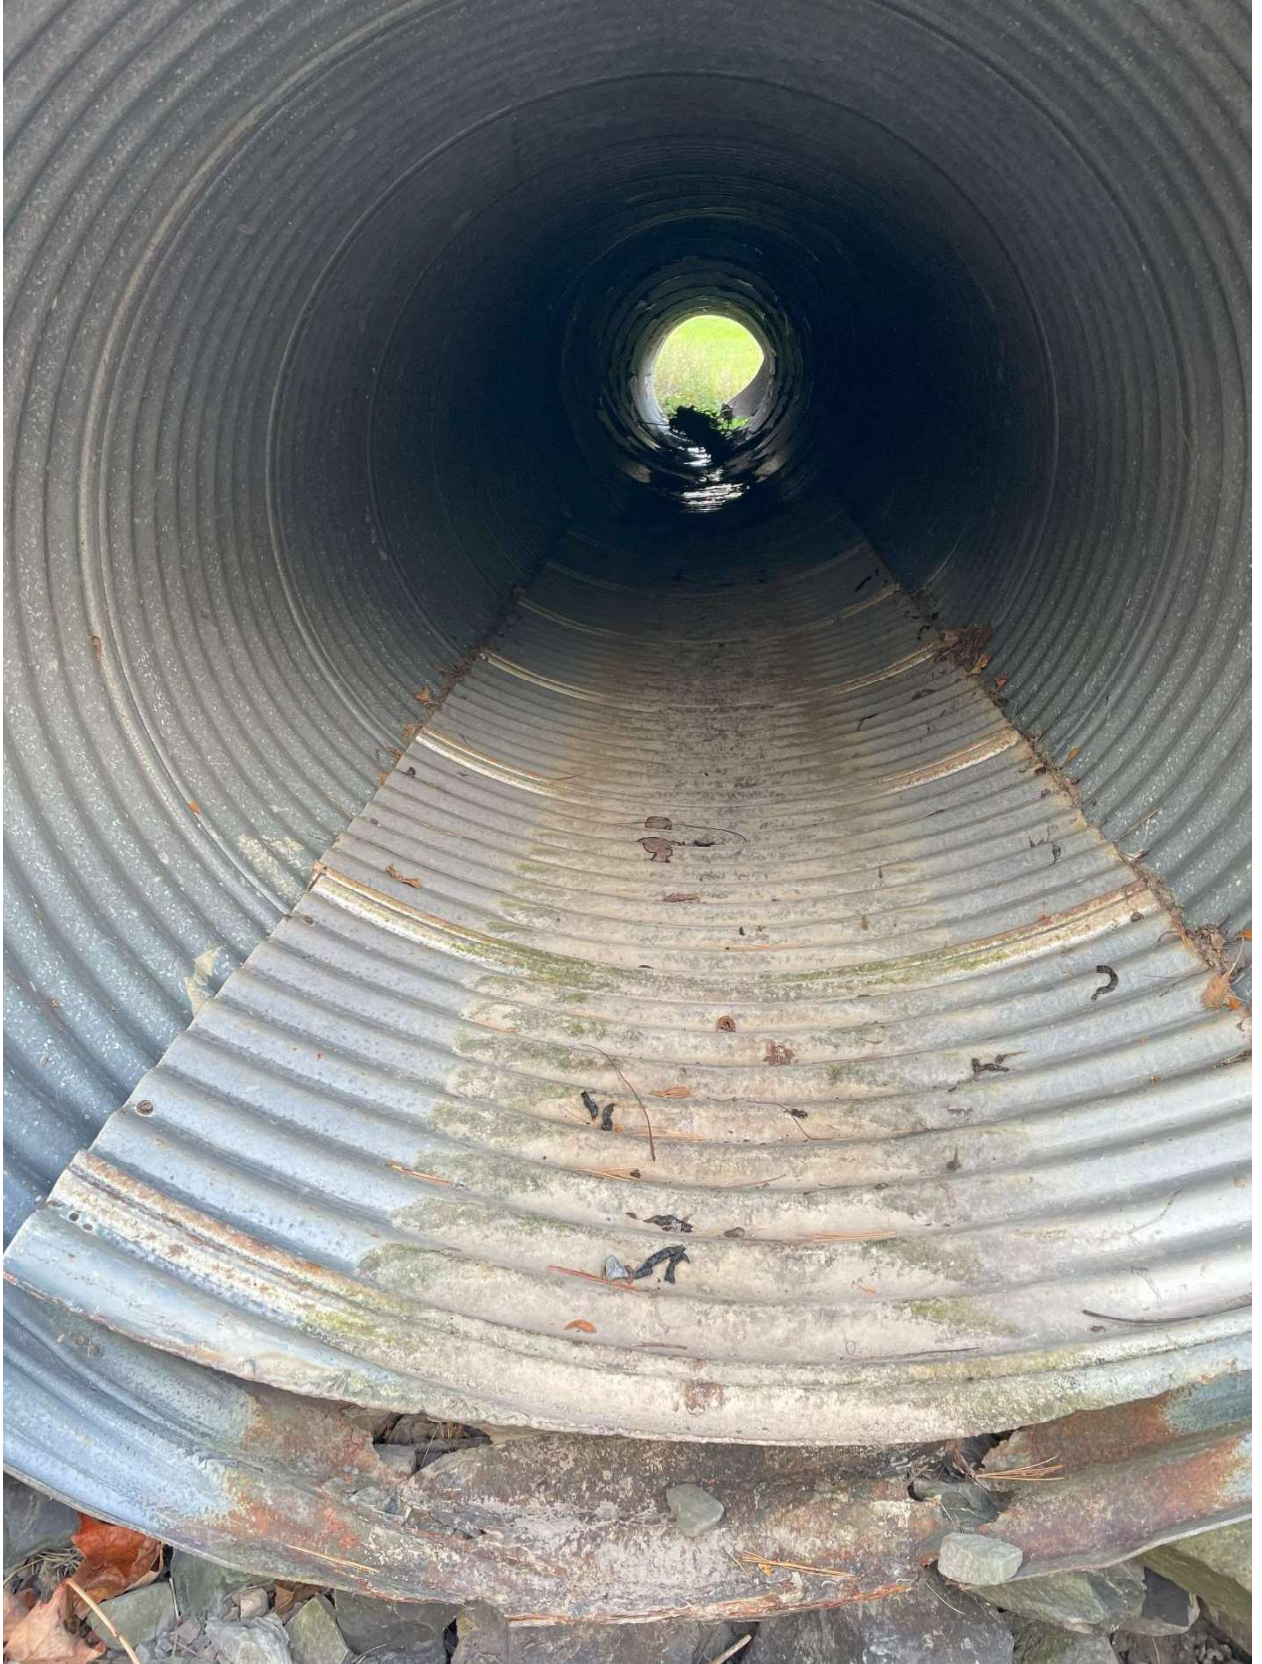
Garrett Road culvert looking west. No embedment throughout the culvert.
